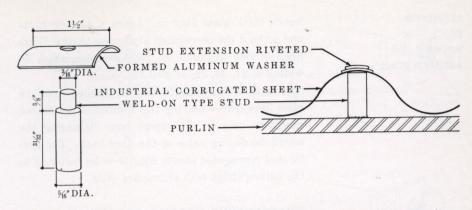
Weldable composite stud fastener, having a steel base with an aluminum shank and aluminum washer, left, and cross-sectional view of its application, right. Studs are first automatically welded with an arc gun to structural member in proper location, then a sheet is driven down over each stud with rubber mallet. Stud extension is then riveted over formed aluminum washer.
